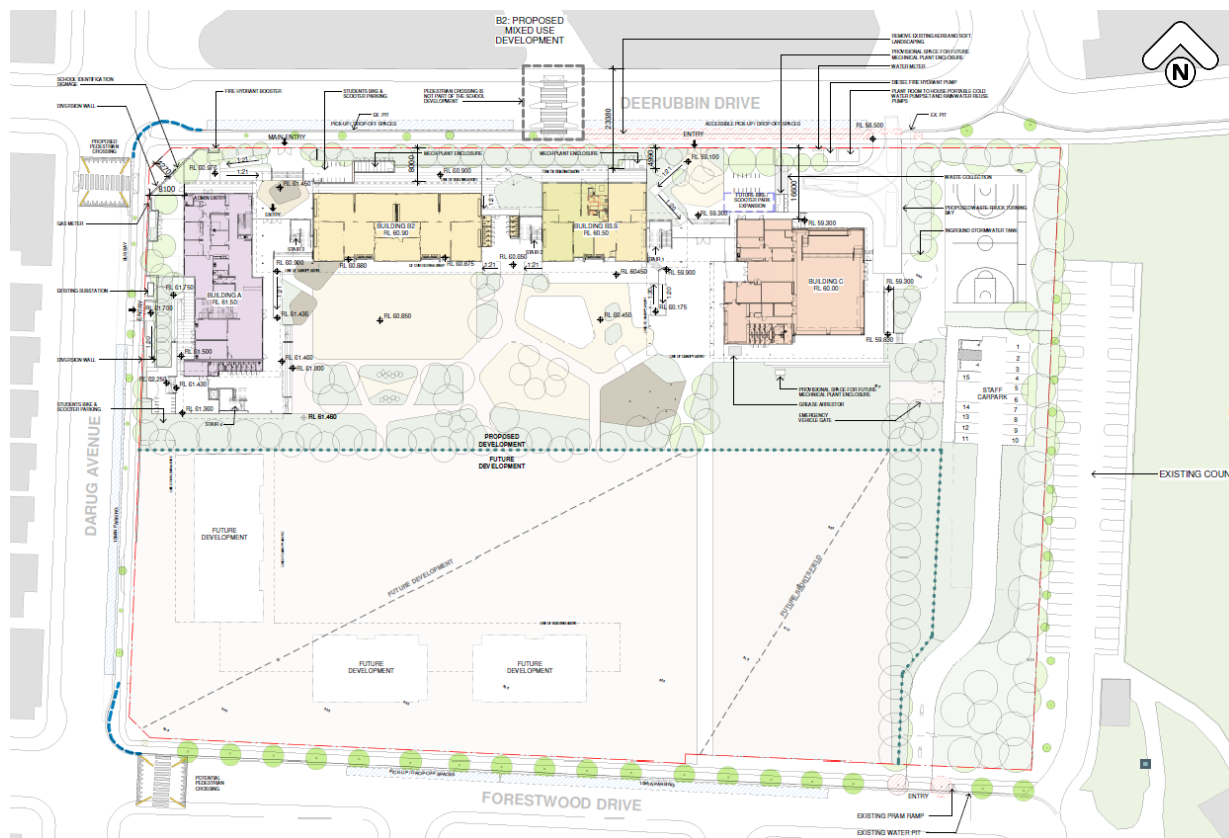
Development Proposal Site Plan (Source: NBRIS)
